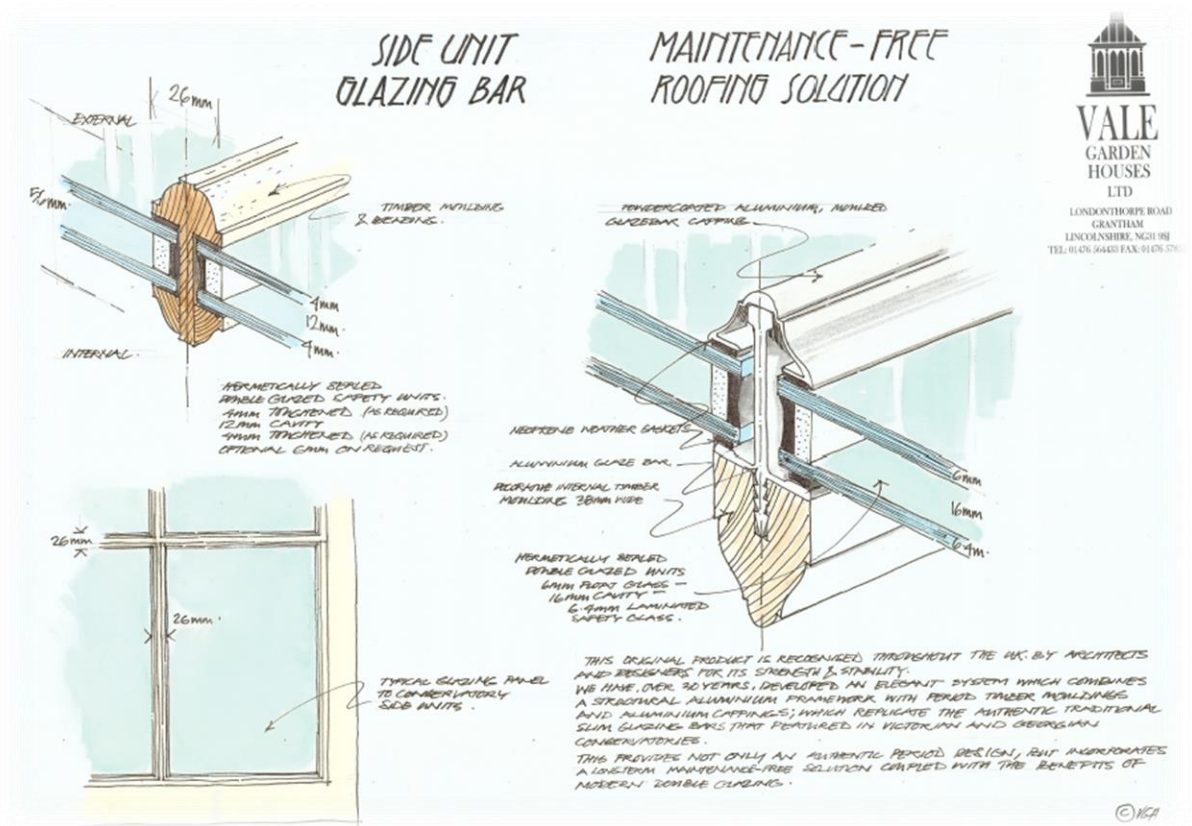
Illustrated glaze bar section of roof and side glazing.
